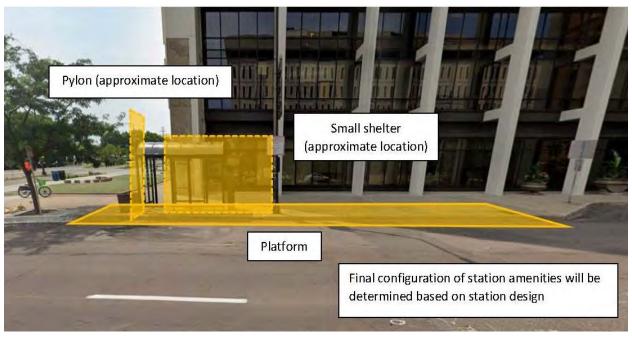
Robert Street North and Kellogg Boulevard proposed southbound platform adjacent to the Kellogg Square Apartments.
